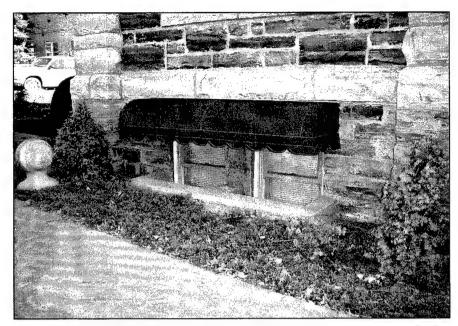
South basement windows and detail of stone walls, HPA facilities.
